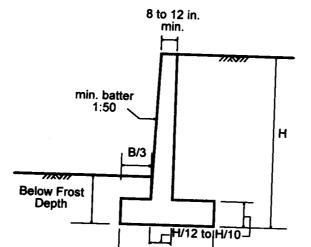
Preliminary dimensions for gravity walls and cantilever walls. [After Clayton and Militisky, 1986.]
